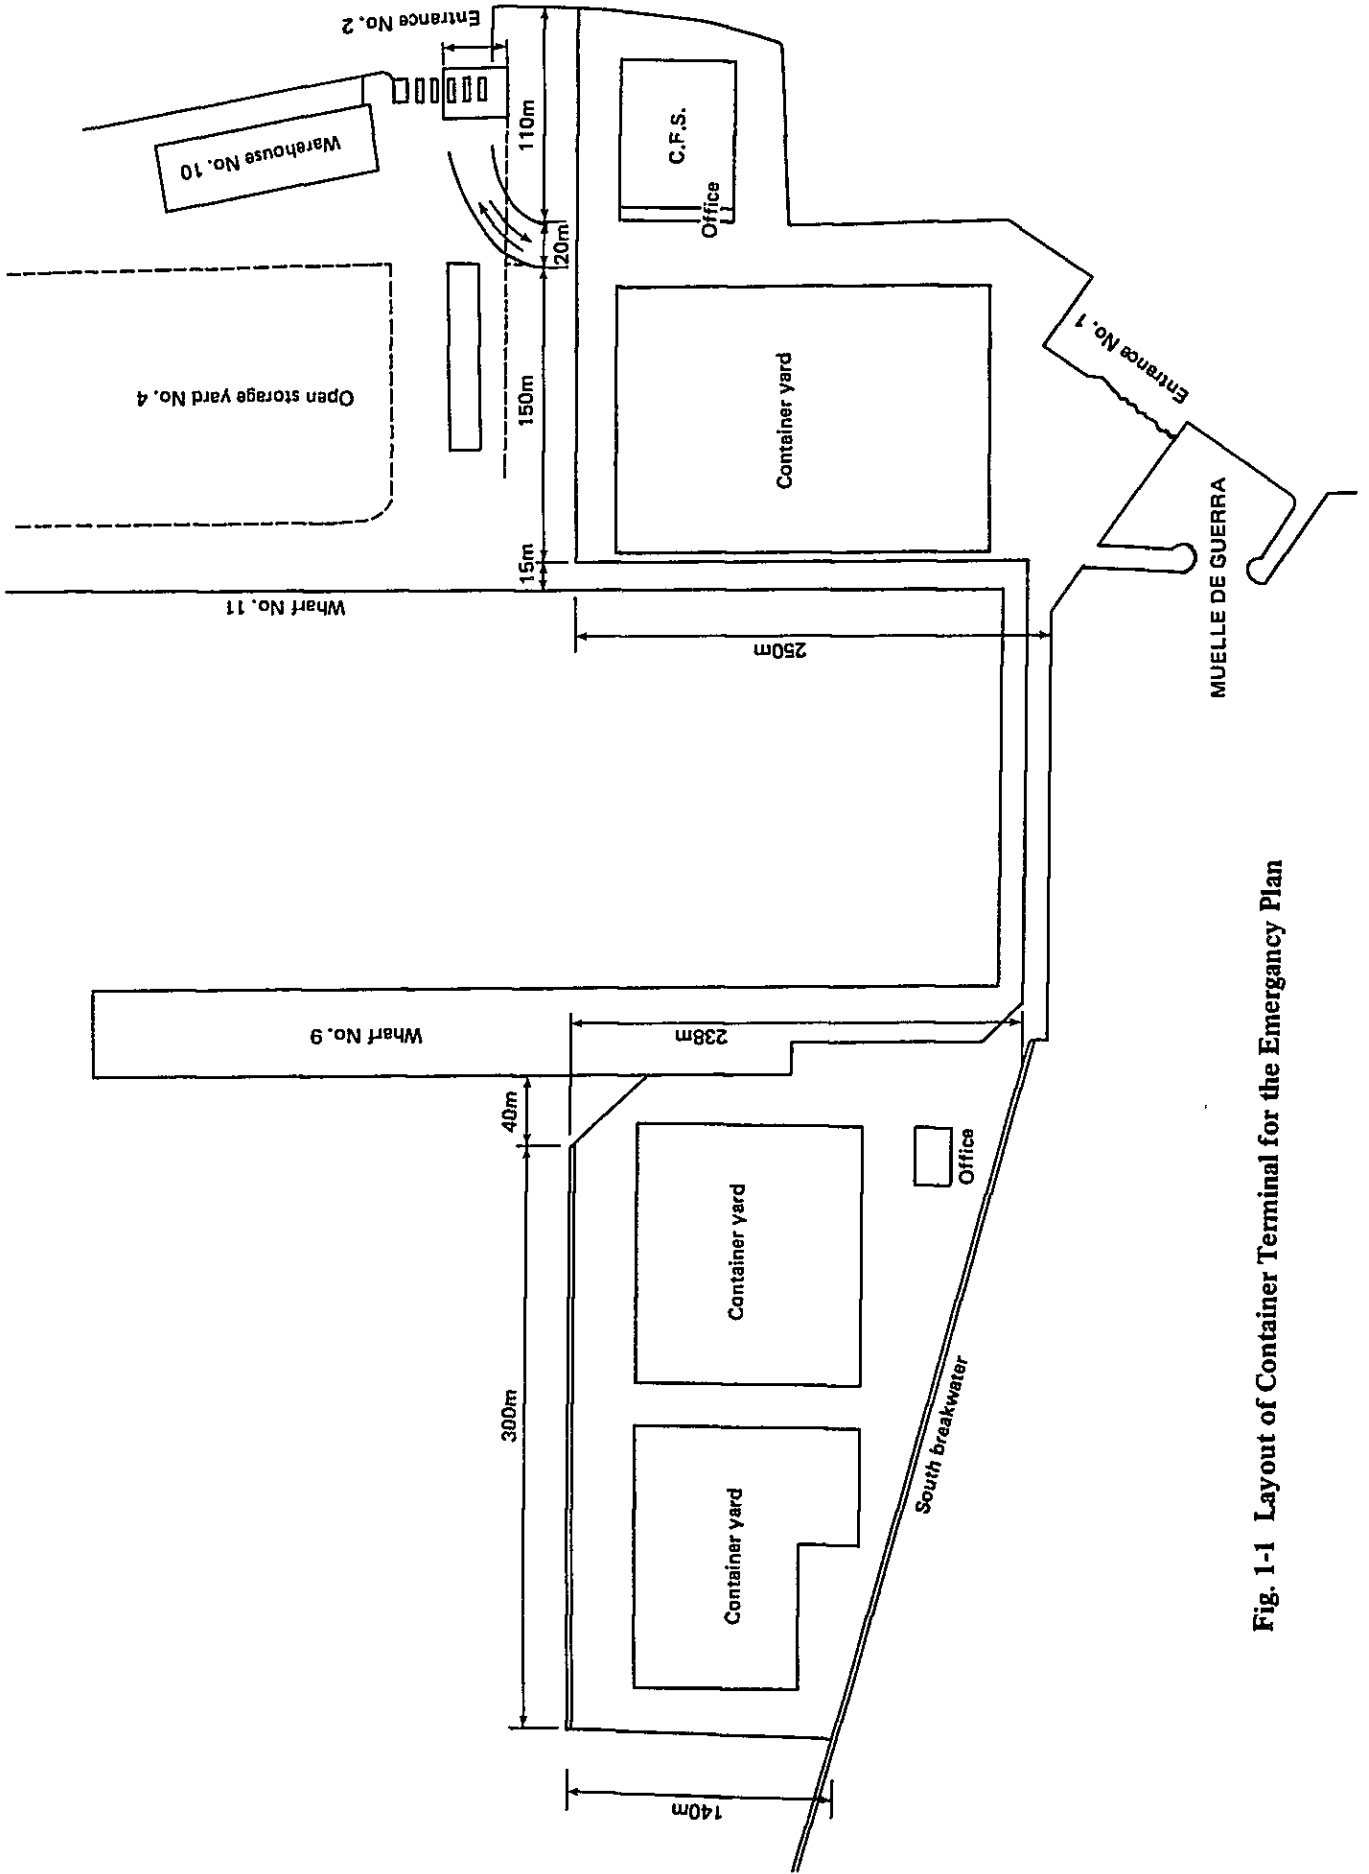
Layout of Container Terminal for the Emergency Plan
